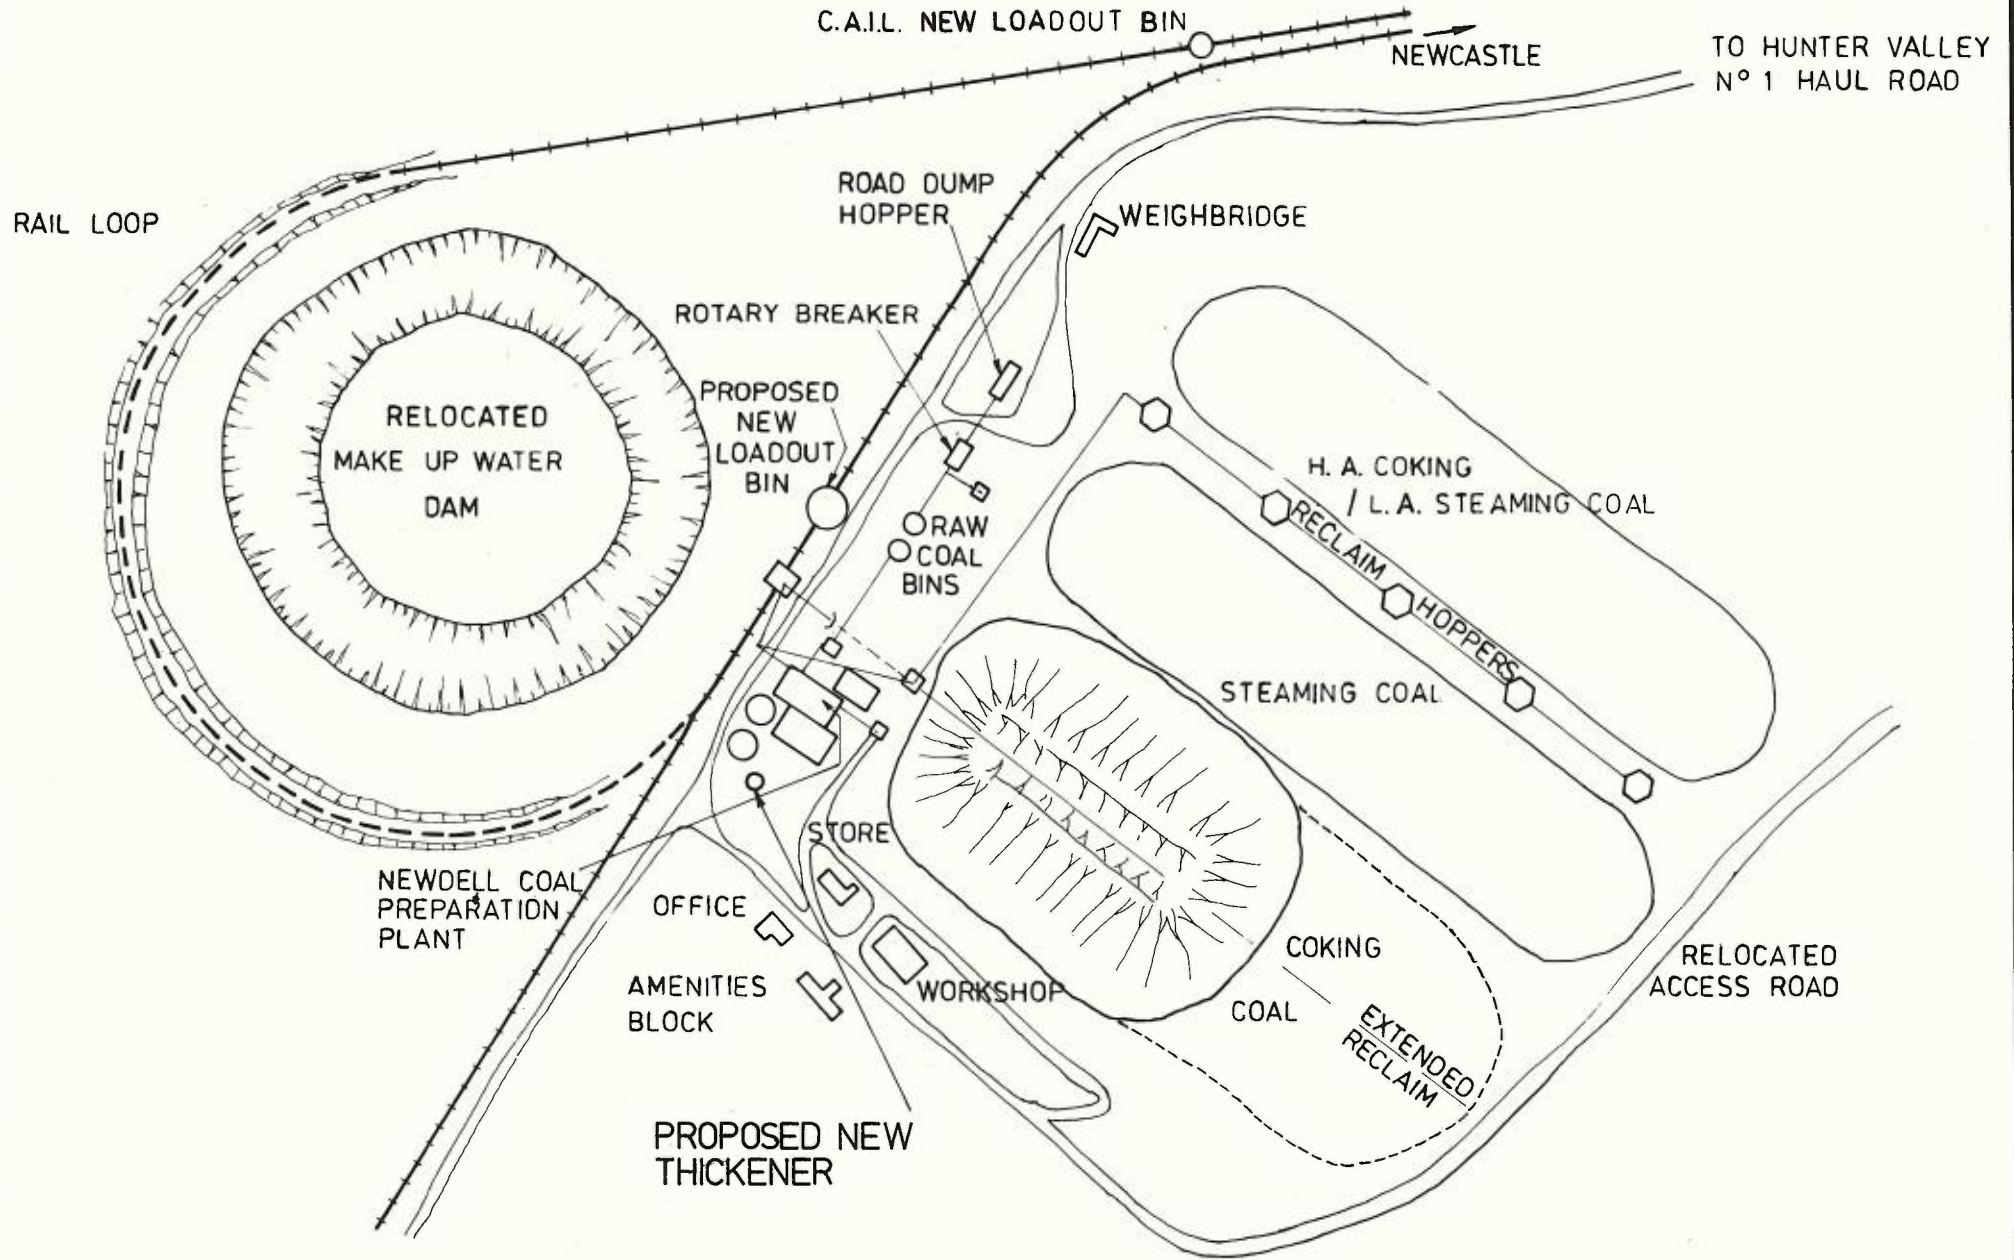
EXISTING NEWDELL COAL WASHERY AND LOCATION OF PROPOSED THICKENER
